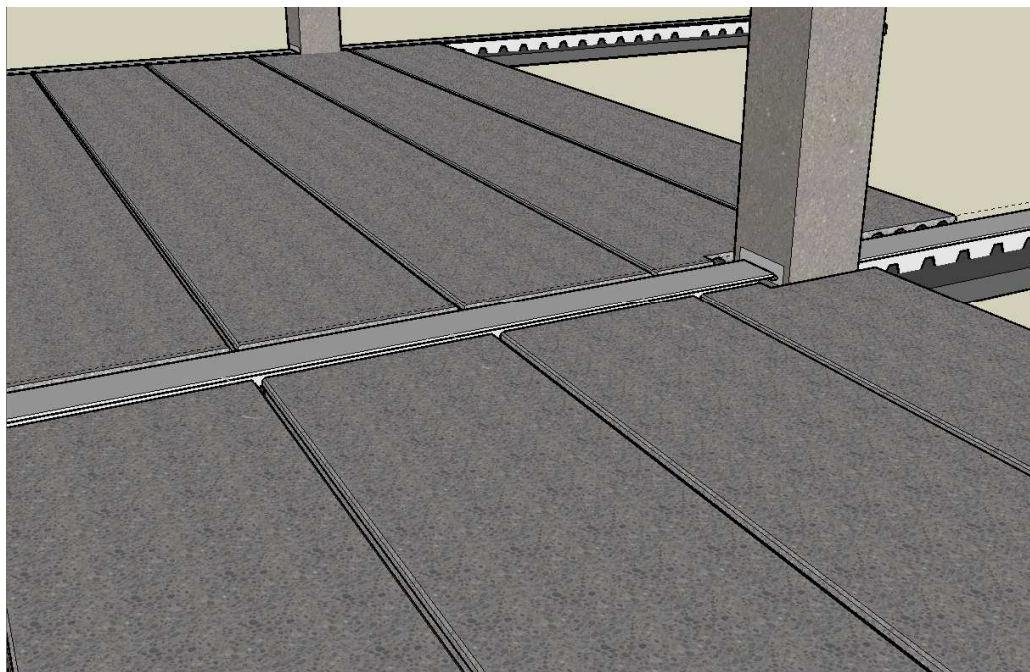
Place second bay of hollow-core & reposition rebar
